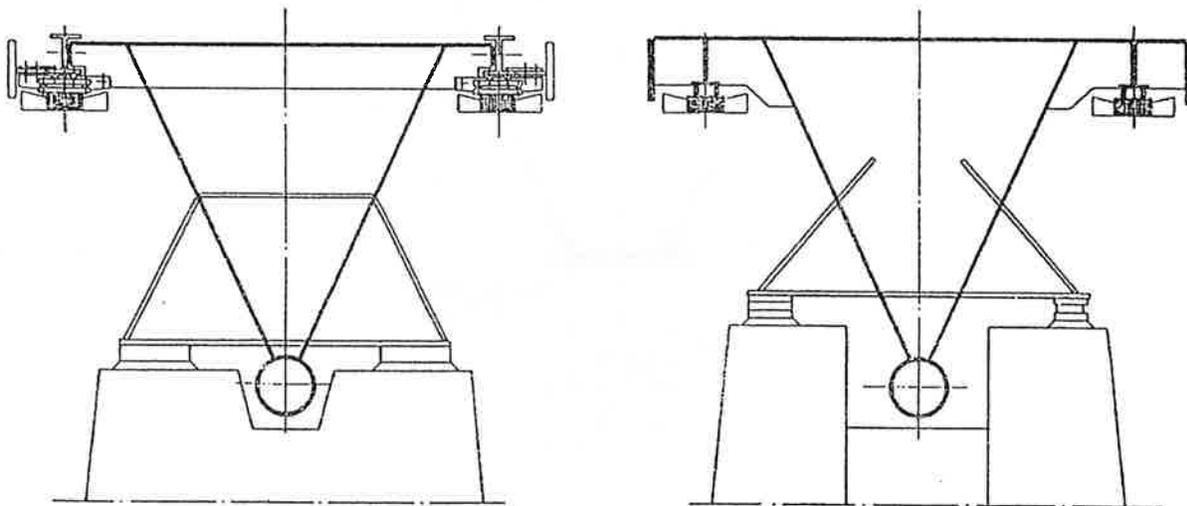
Cross-Section of Double-Span Steel Beam (Northern Loop)
